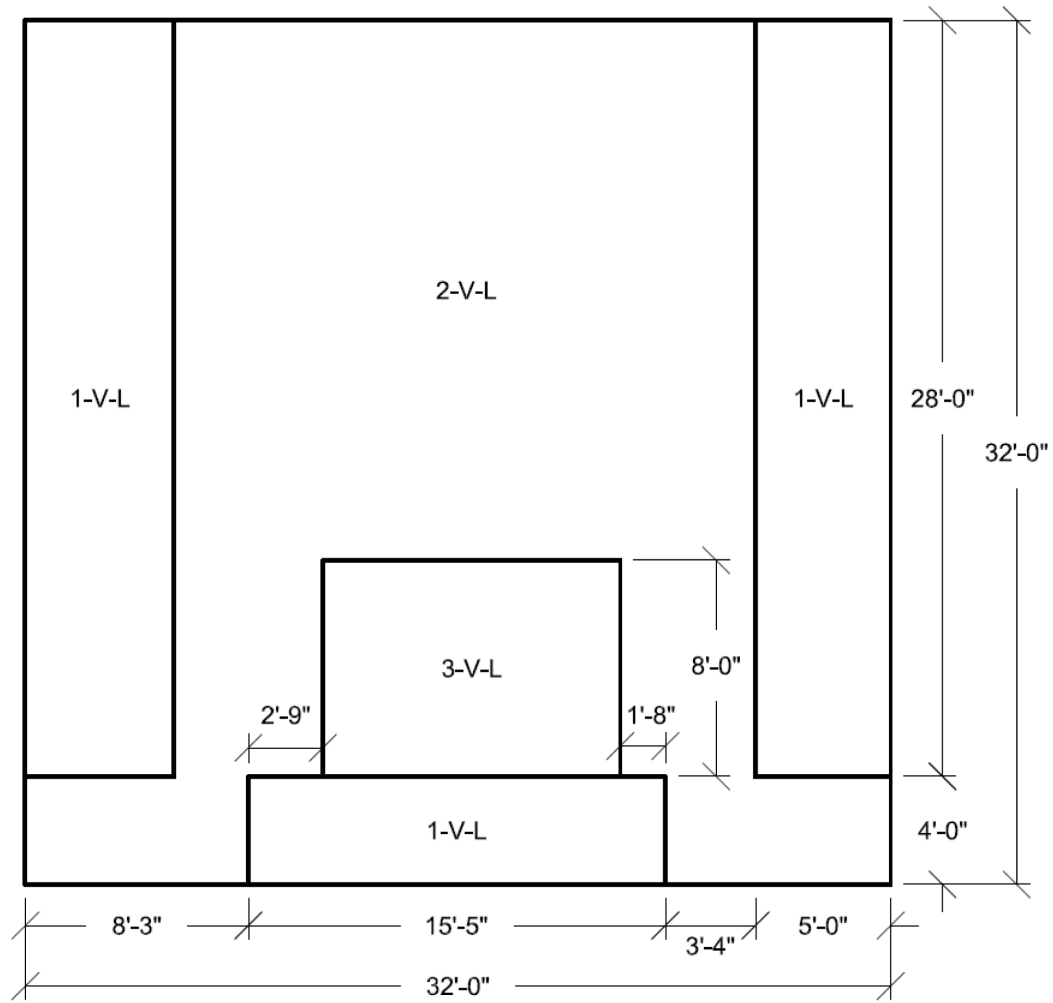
H.6-188 DGFOV Wall 12 Looking From Outside
